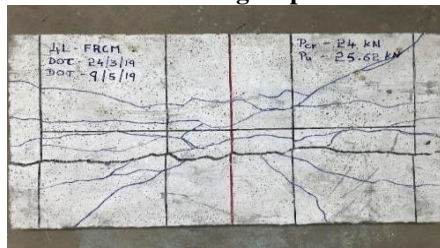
(b): Crack pattern of two point loading flexural test in shorter span
